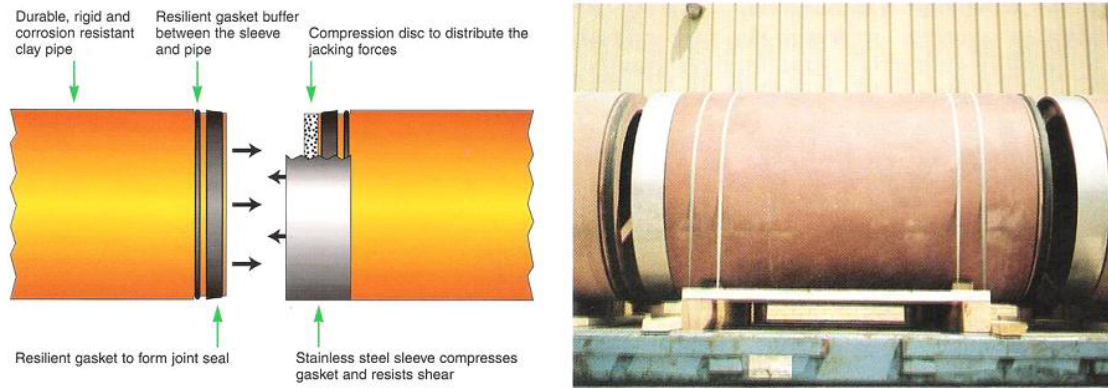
Vitrified Clay Pipe Joint Detail and Jacking Pipe after Shipping (Mission Clay Pipe, 2005).
